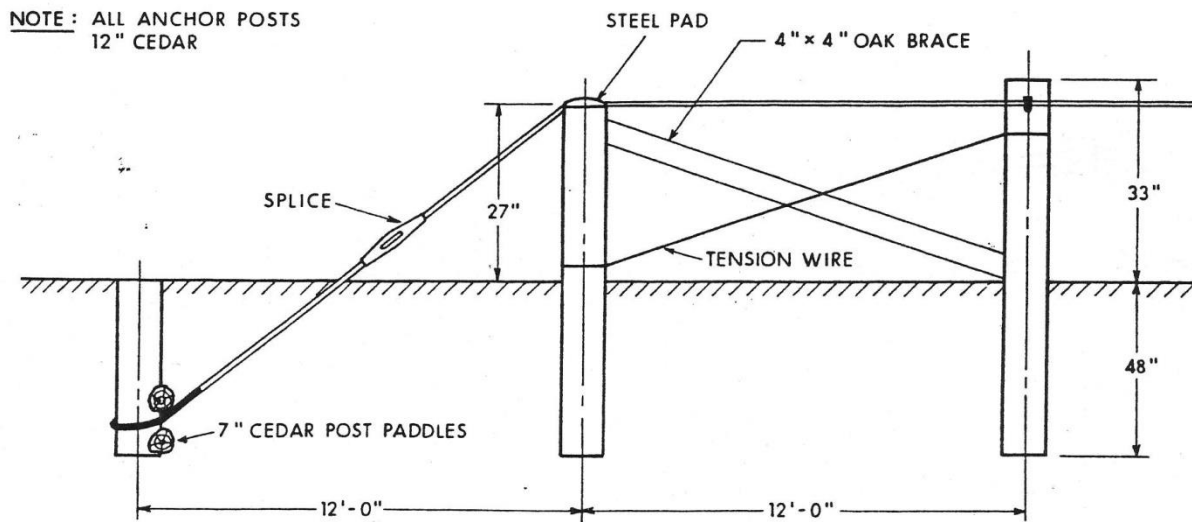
Canadian Department of Highways "Modified" Cable Anchor Details, 1967 [19]
